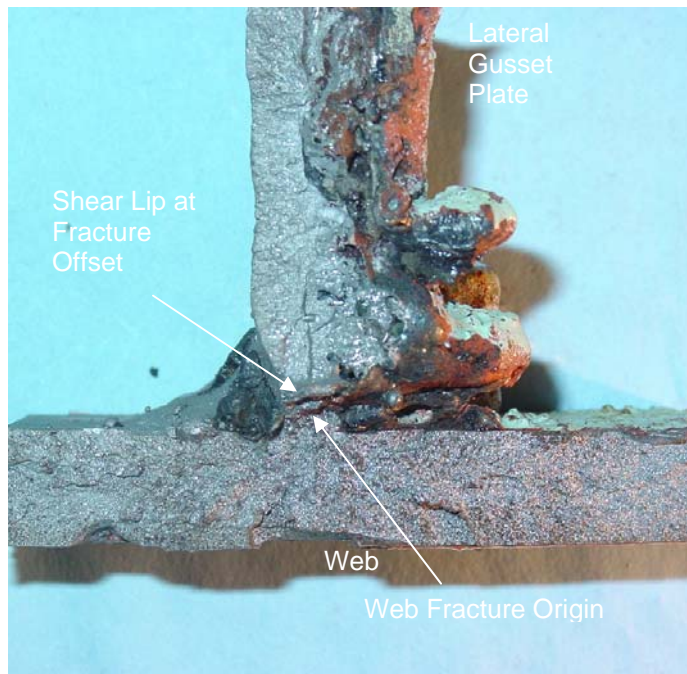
Fracture Origin of Girder Fracture at the Intersection of the Lateral Gusset and Vertical Stiffener Welds.
